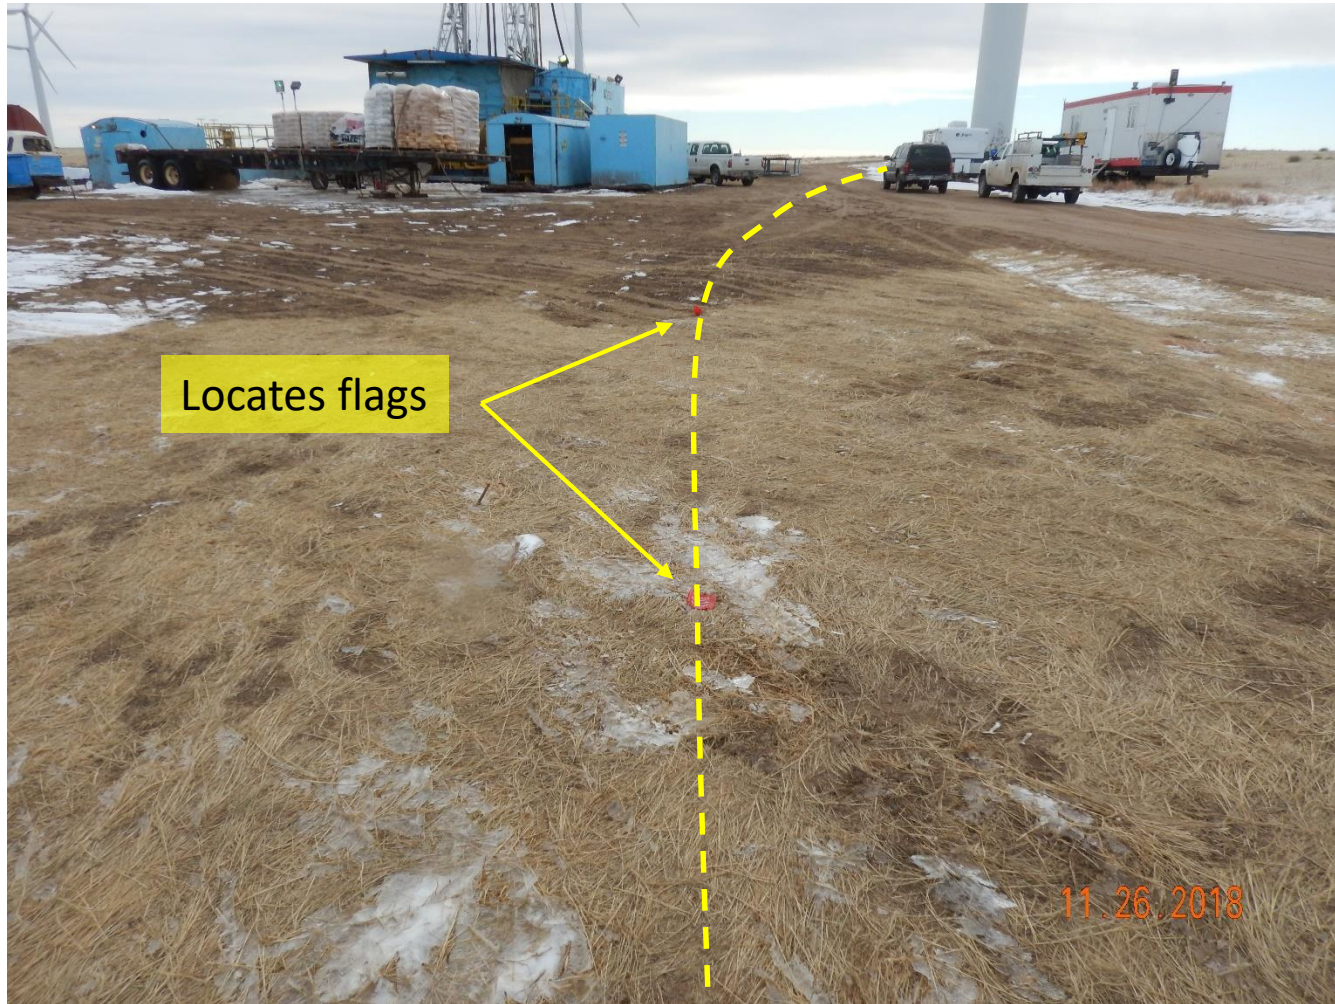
Photo taken from the north end of the location, facing south. Photo shows buried cable appears to travel south under the northwest corner of the pad, and then southwest under the access road towards the wind mill
